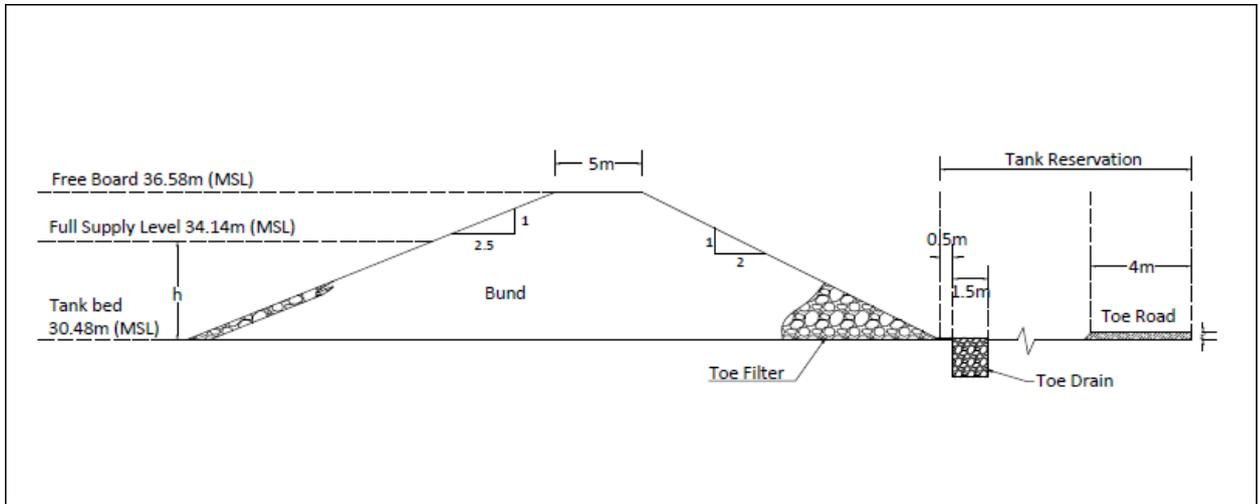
Typical Cross Section of the Mahalindawewa Tank Bund
